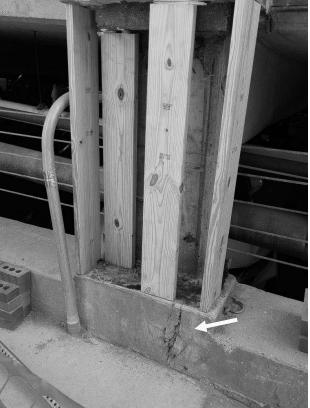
Column 12A inspection opening at Level 1 PT beam end (brick veneer removed, wood 2x installed as temporary support for brick). Note the concrete distress at the retaining wall.
